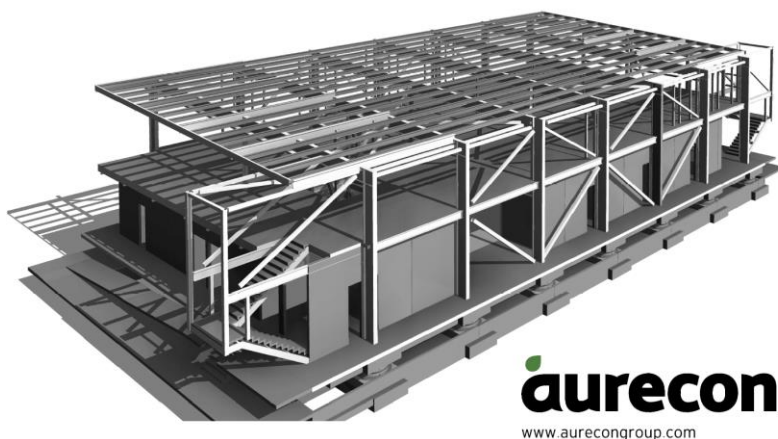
Structural Revit Model of ATC facility (Christchurch)
